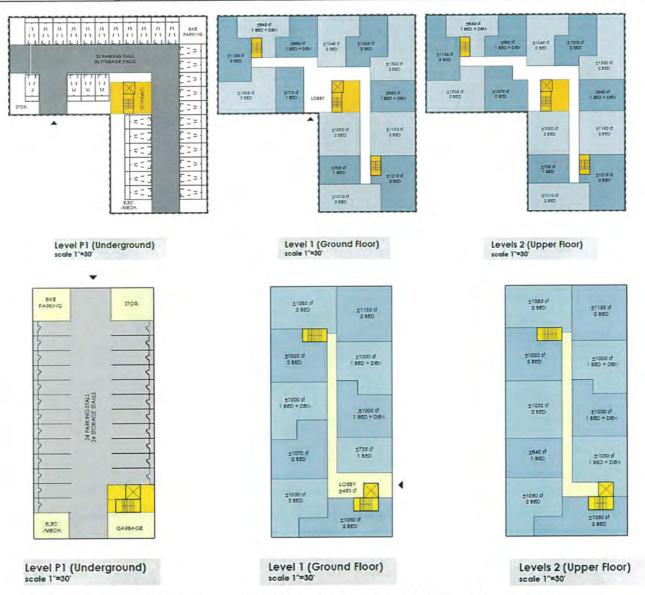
Apartment Building Floor Layouts - 196 Phillips Drive
